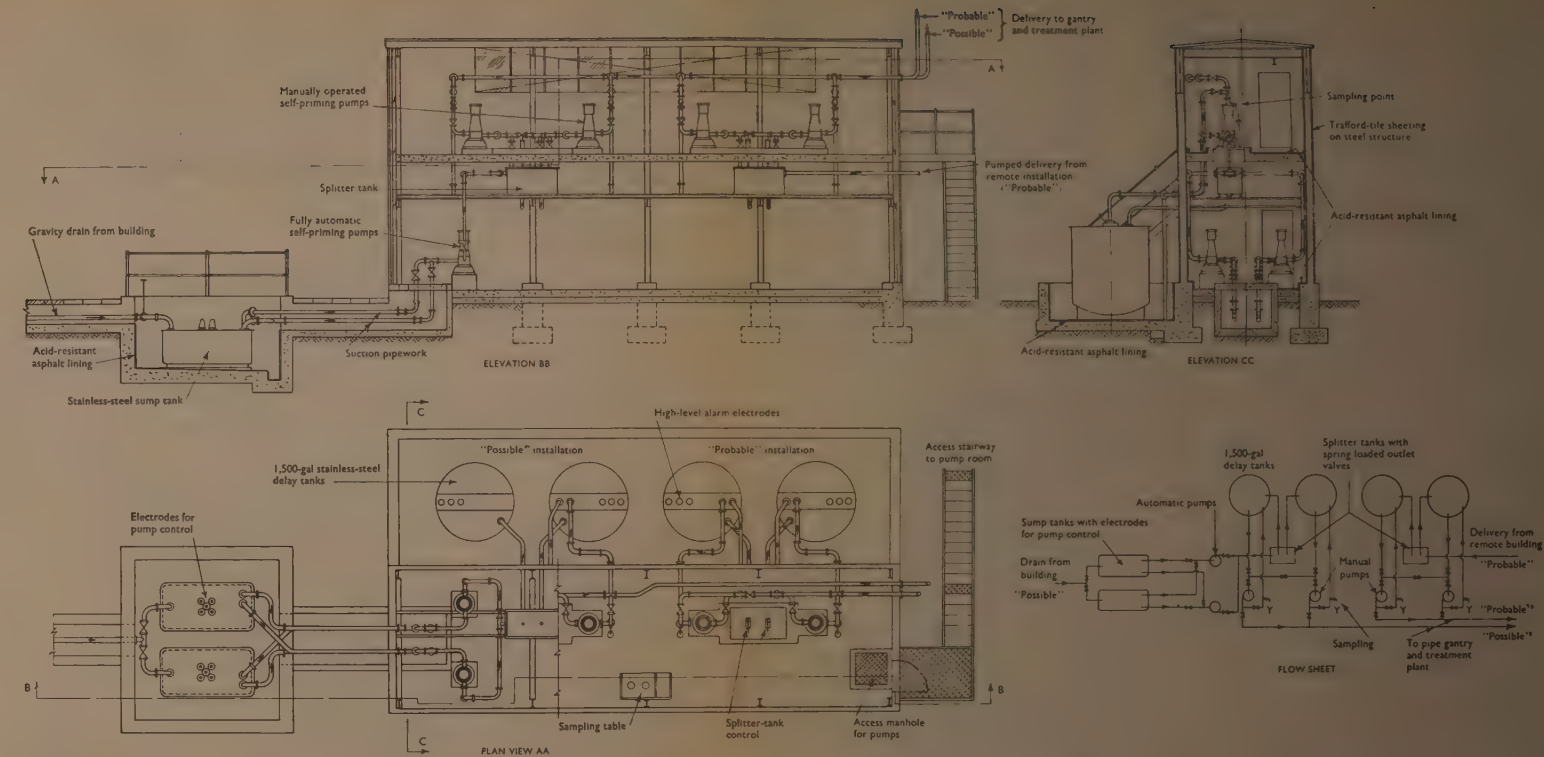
TYPICAL SUMP AND DELAY-TANK PUMPING INSTALLATION WITH FLOWSHEET
